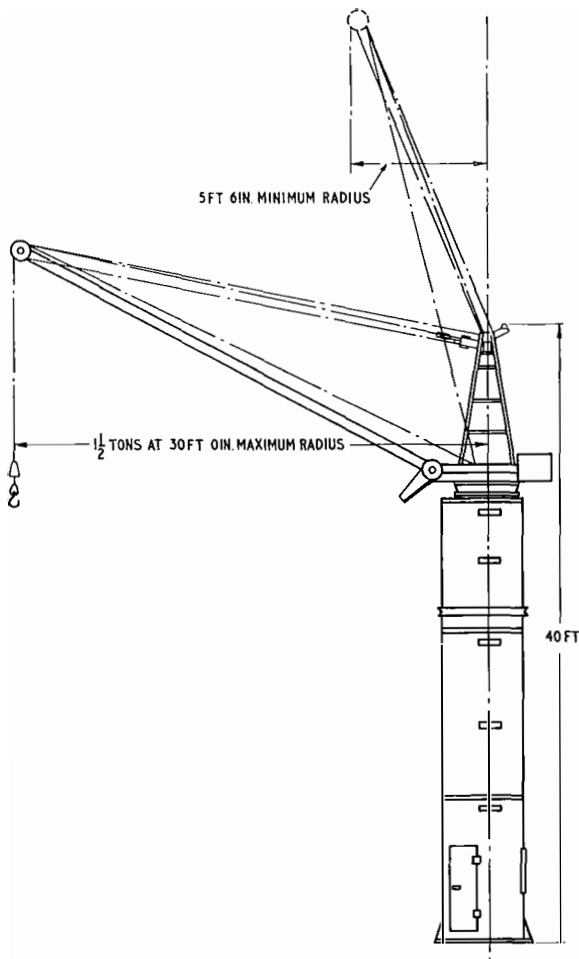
CRANE USED FOR REINFORCED-CONCRETE TOWER
